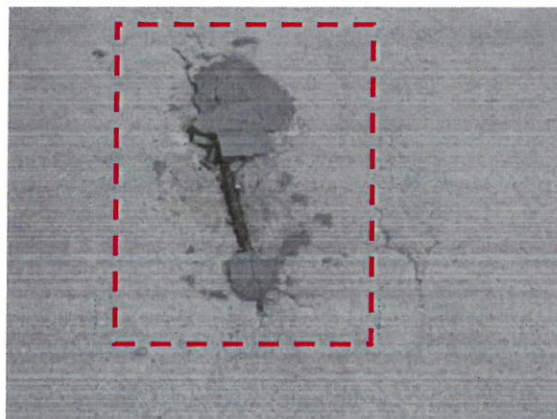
Concrete spall on top surface of slab on pedestrian bridge
